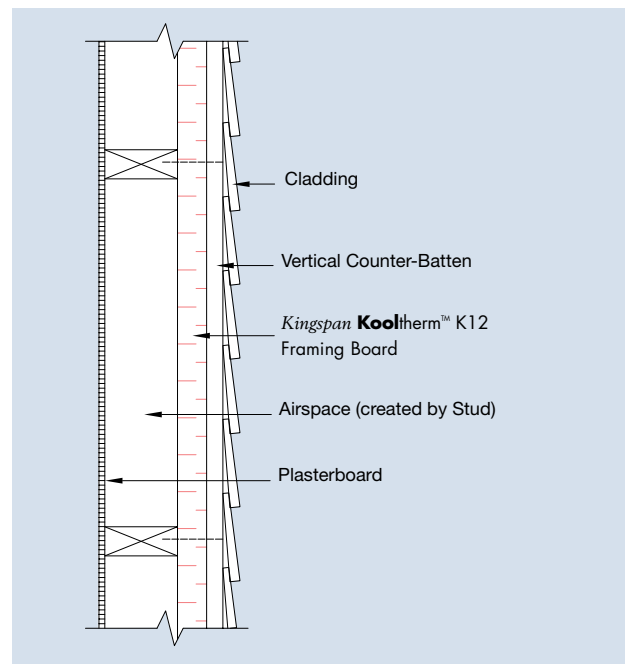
Side elevation – Stud wall with Kingspan Kooltherm™ K12 Framing Board and vertical counter-battens using an internal plasterboard lining
